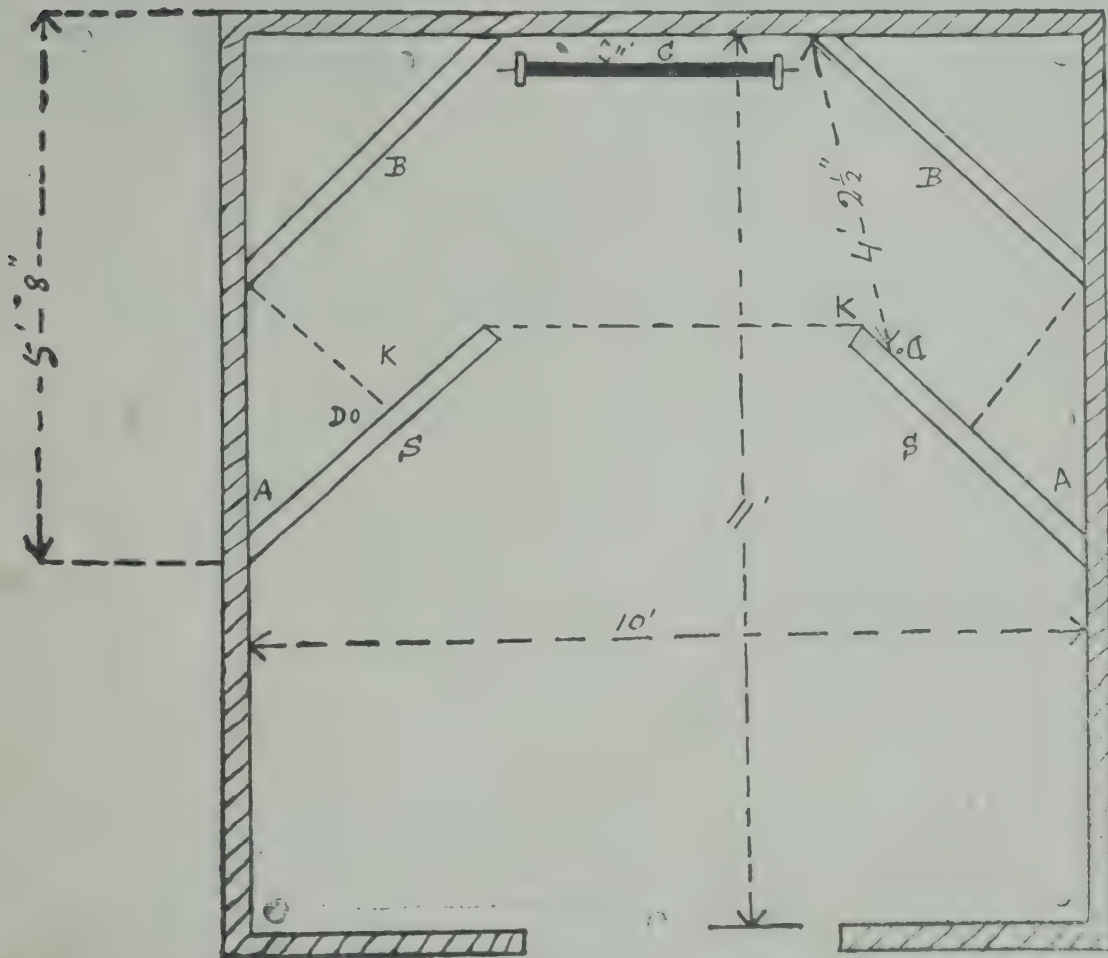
Plan of Seriplane Board Inspection Room. External surfaces of reflecting screens S, walls B,C. and floor inside dotted lines are painted flat gray. The rest of the floor and walls, ceiling and internal surfaces of screens are flat white.
